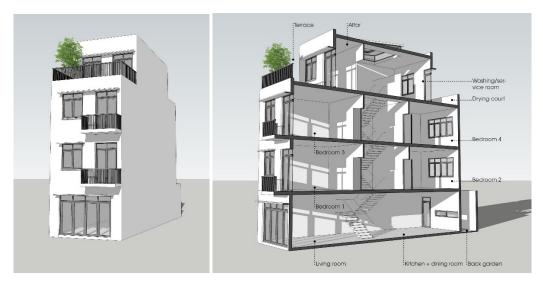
Basic architecture and spatial layout of garden row houses (ii)
